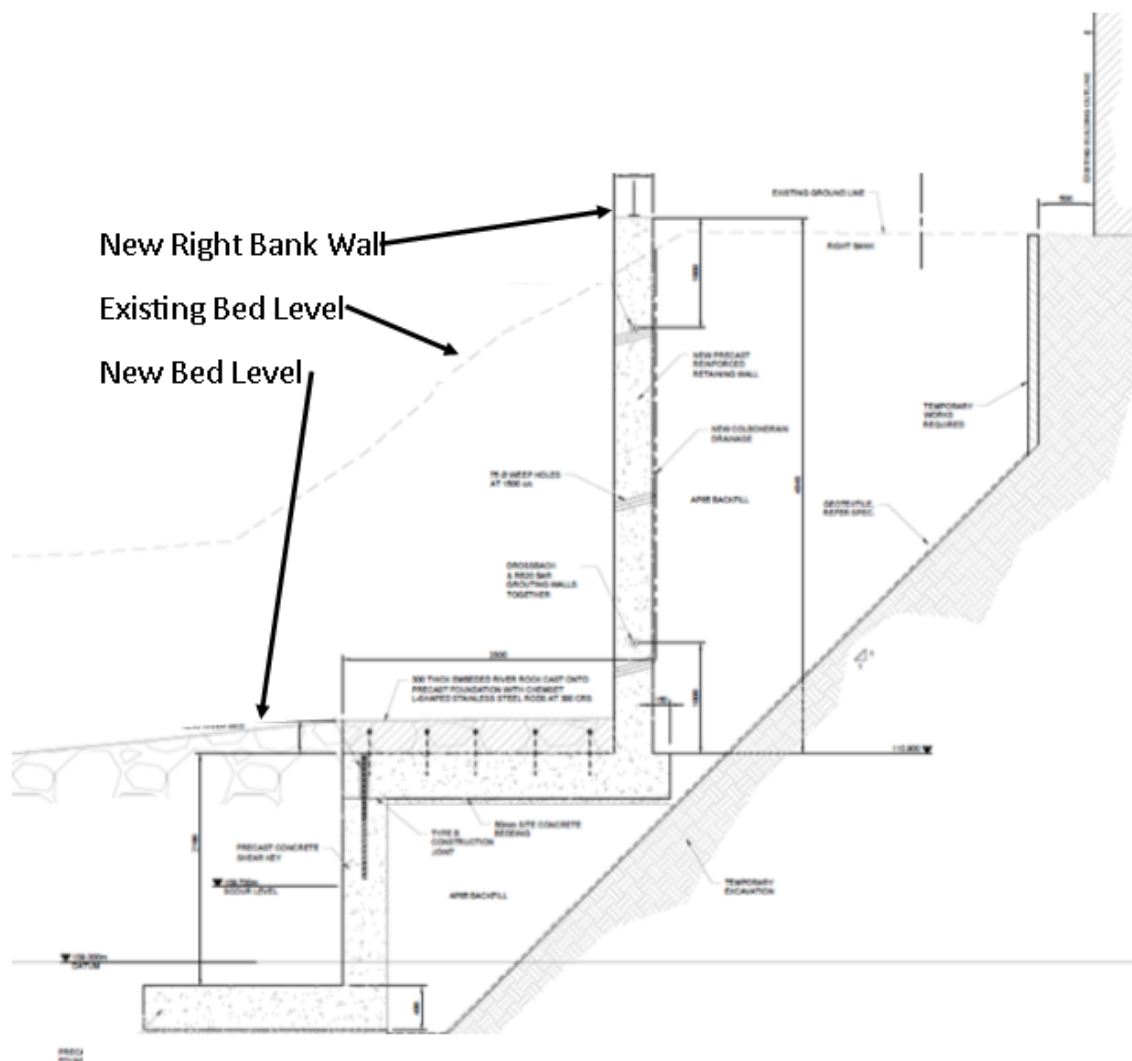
Typical Elevation View of the Upstream Right Bank Retaining Wall
